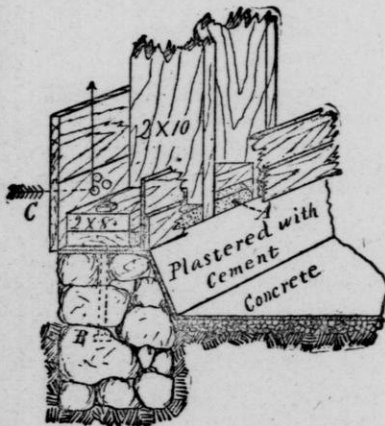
Showing the construction and ventilation of the walls of a rectangular silo. The sills are two inches narrower than the studding, to leave air space between sills and lining. A, is two inches of mortar made by stirring sand into coal tar, boiled until it is hard when cold. B, is bolt anchoring sill to wall, placed about four feet apart. C, ventilator between studding.
